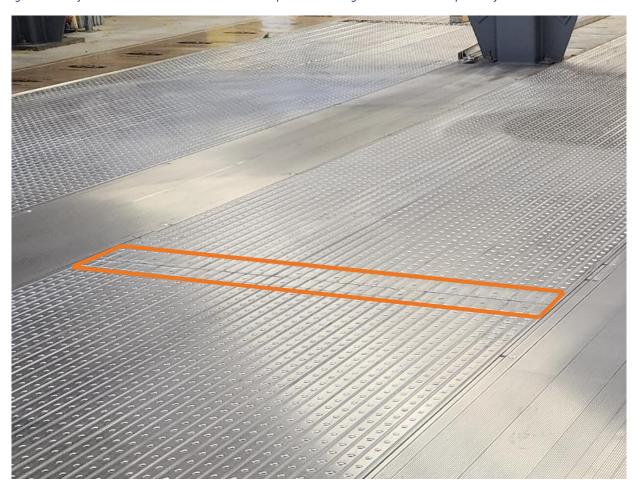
Finished ILDFA assembly with end-to-end connections indicated inside of red box
